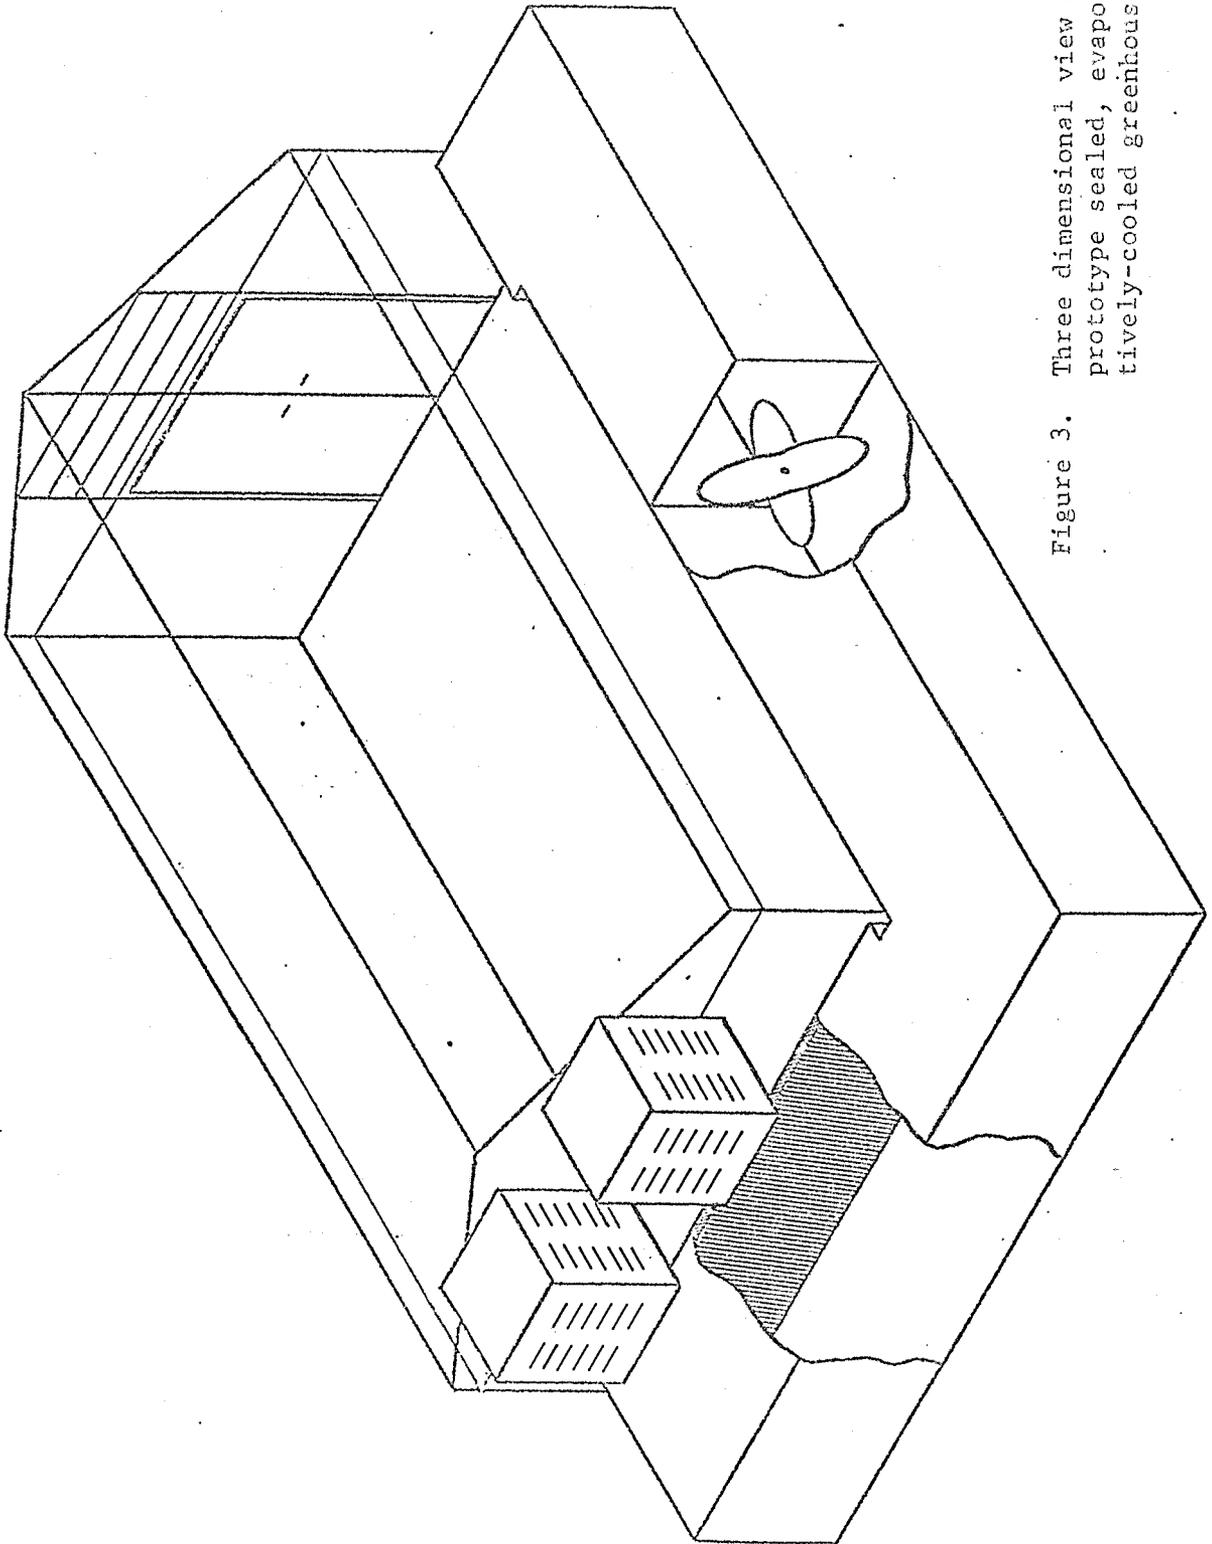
Three dimensional view of prototype sealed, evaporatively-cooled greenhouse.
